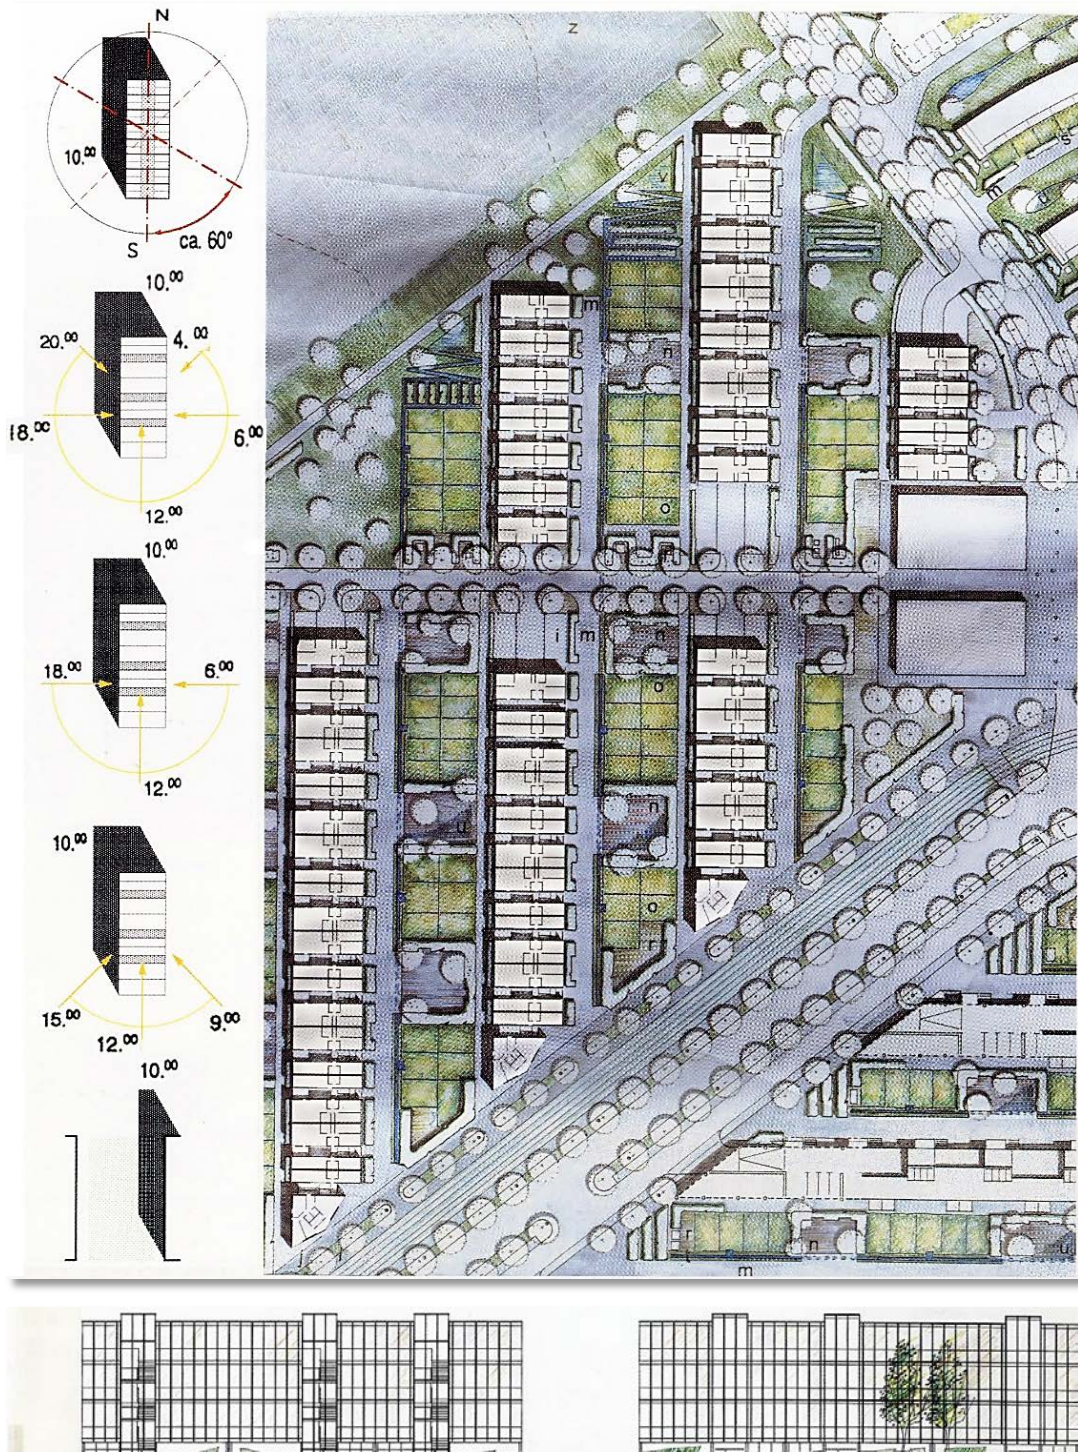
Solar city, Linz. East-west oriented linear blocks, Site plan & Elevations
